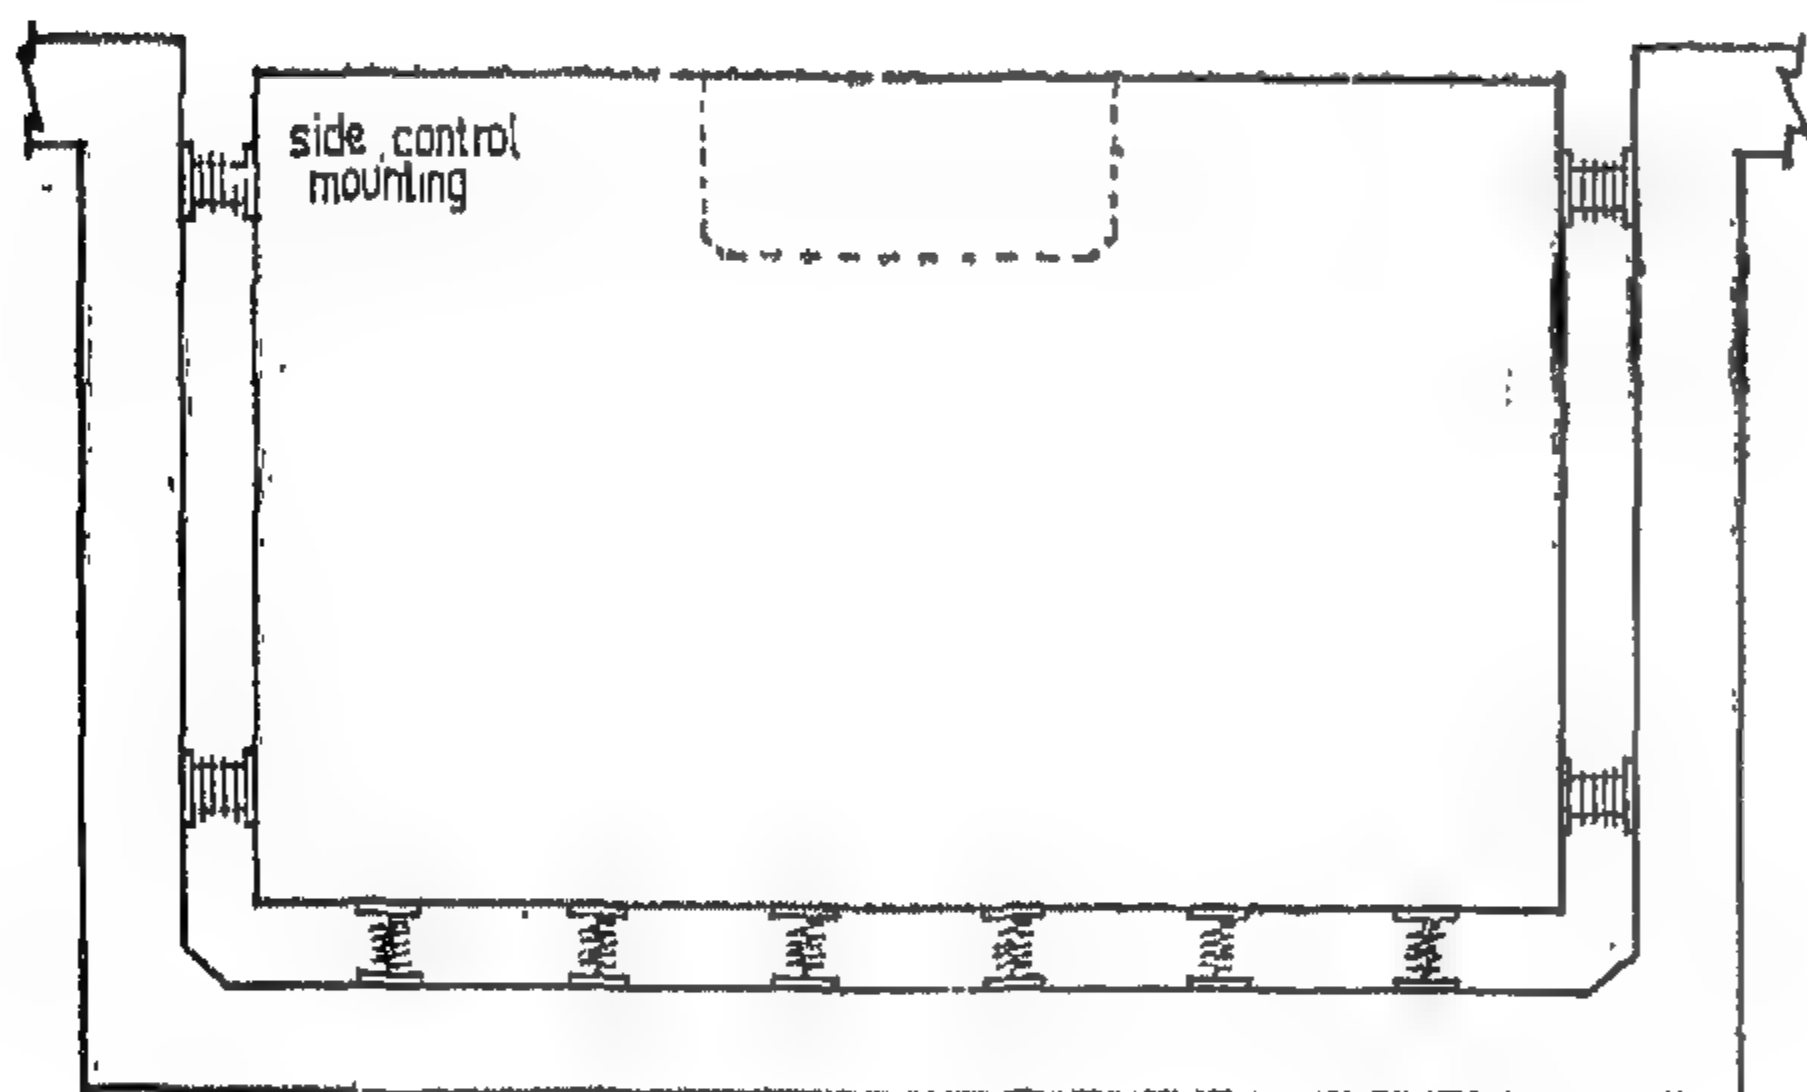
ILLUSTRATING POSITIONING OF SIDE CONTROL MOUNTINGS TO PREVENT TILTING AND ROCKING
